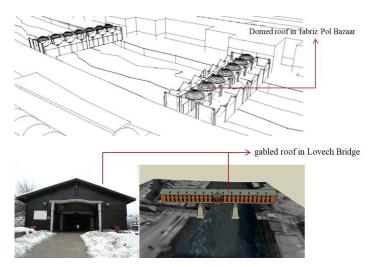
Detail of Tabriz Pol Bazaar and Lovech Bridge roof (Source: Author)
